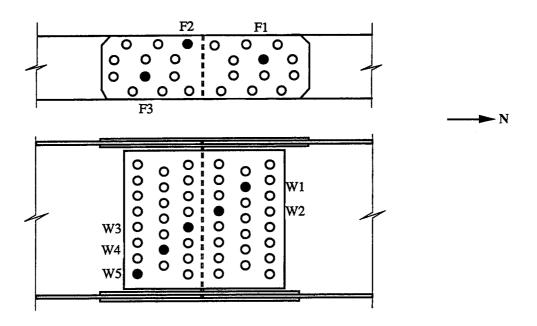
(f) Location of sampled bolts in connection S4 of bridge B2
